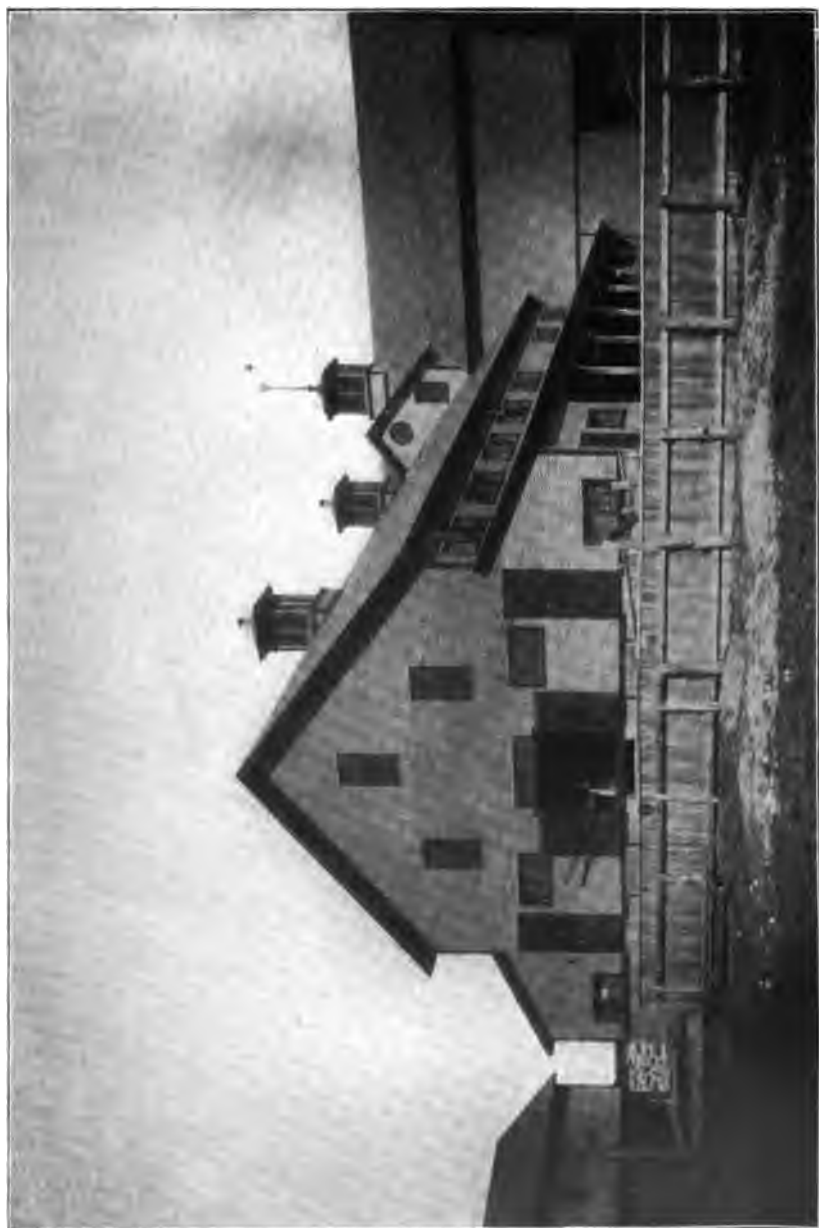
End view of Fig. 8, showing opening under door sill to air chamber beneath central section floor.
